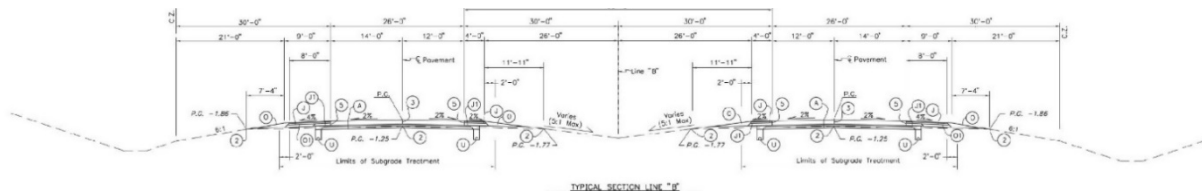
Typical Cross Section from Phase 3 plans, 2010 (R-30194)
